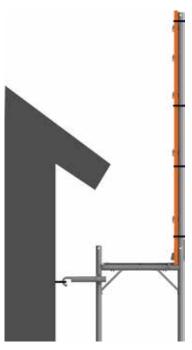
Protective wall on top of scaffolding frame (with reinforcing tube).
